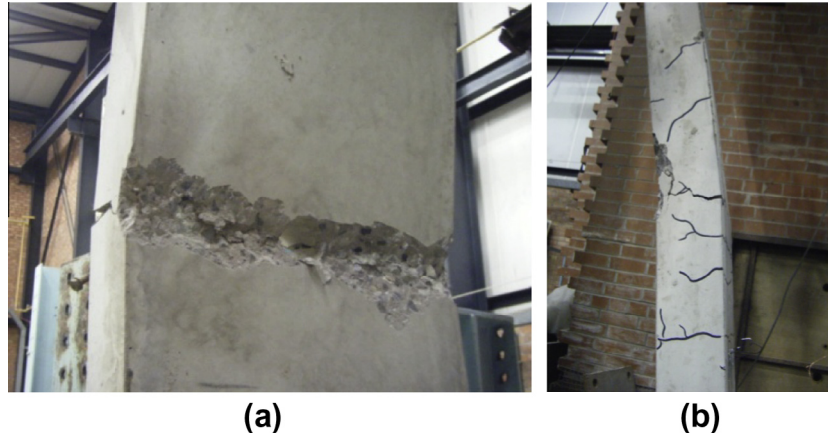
Brittle failure observed in both pre-cracked and un-cracked RC panel elements.
